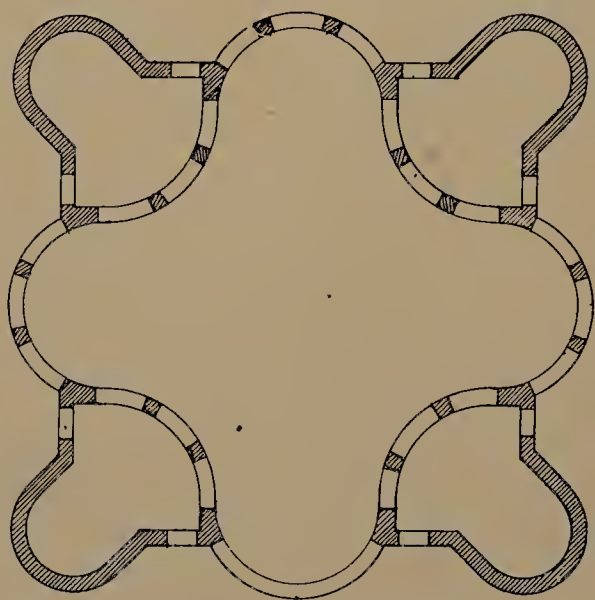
Villa of Hadrian. Plan of a hall with sinuous outline
